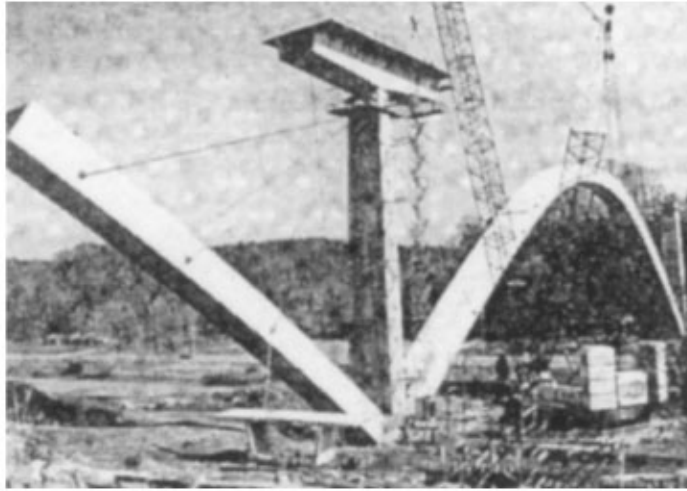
Natches truss arch—cantilever erection of ribs.
